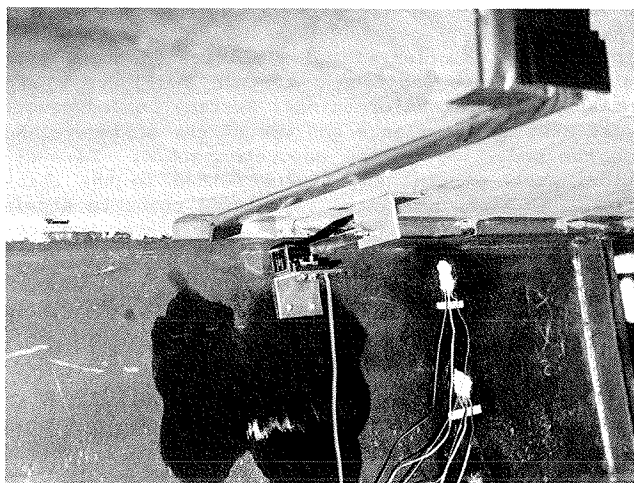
Typical displacement transducer installation to measure horizontal slip.
